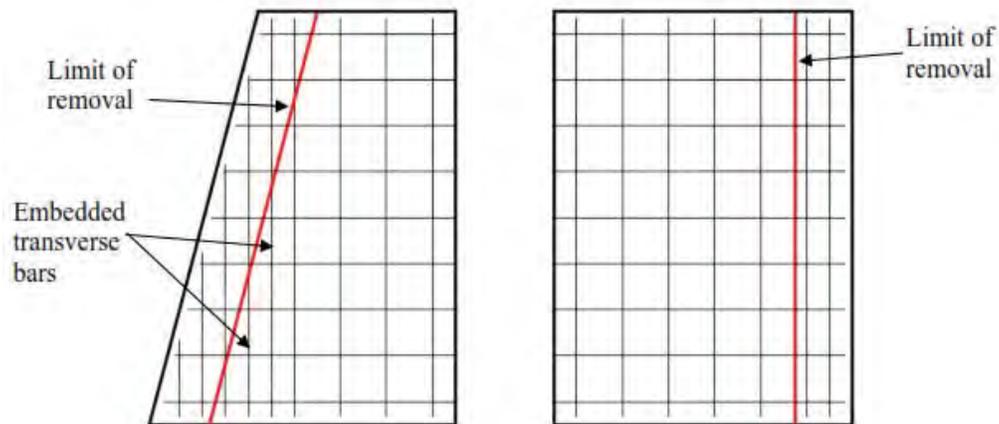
Skewed Bridge Deck Reinforcing (left). Non-Skewed Deck Reinforcing (right).
